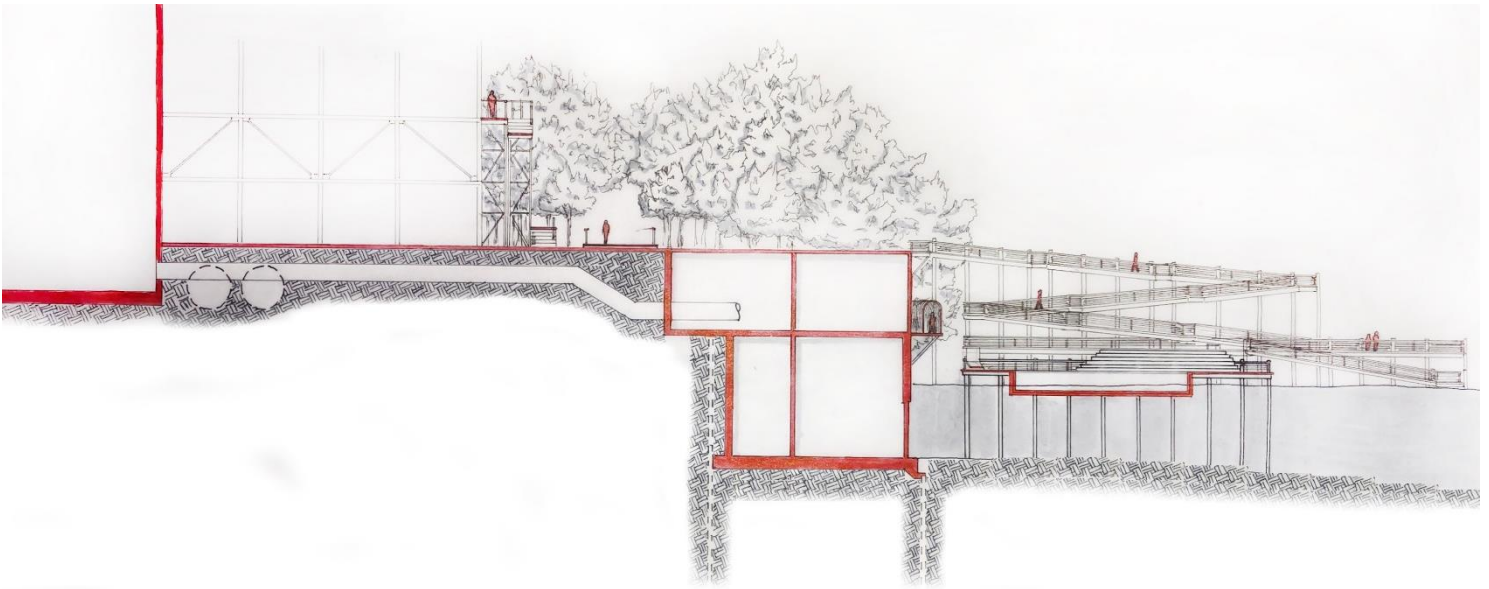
South Section through Catwalks, Plaza, and Pier (source: Author)
